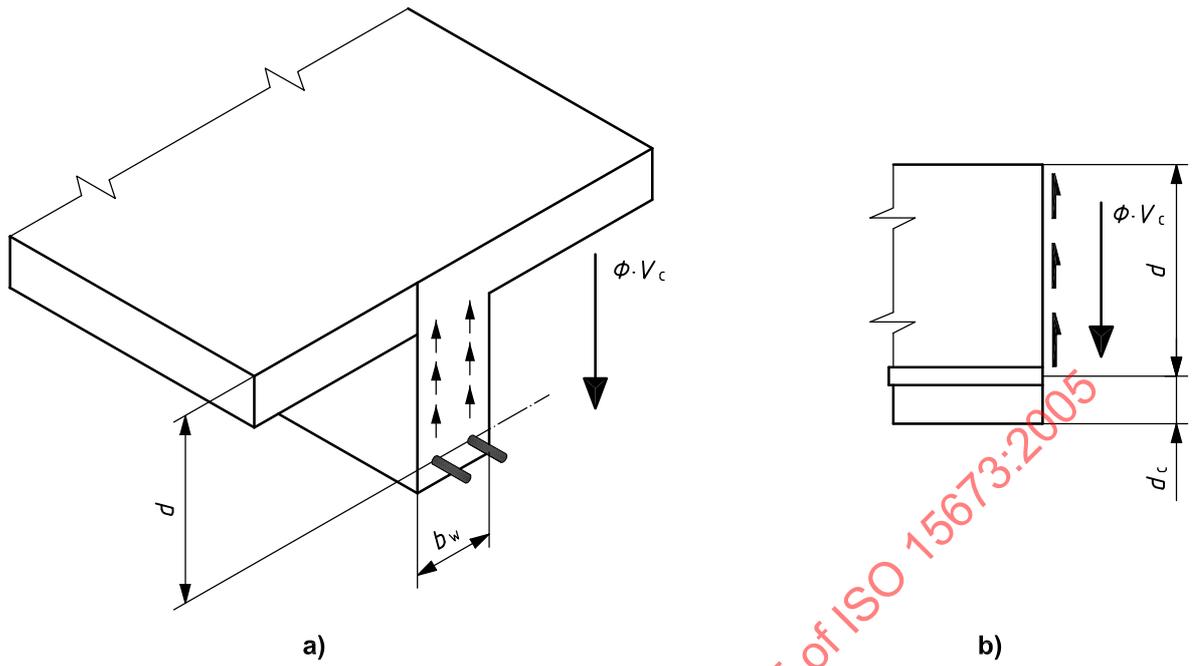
Contribution of concrete to beam-action shear strength in girders, beams and joists
